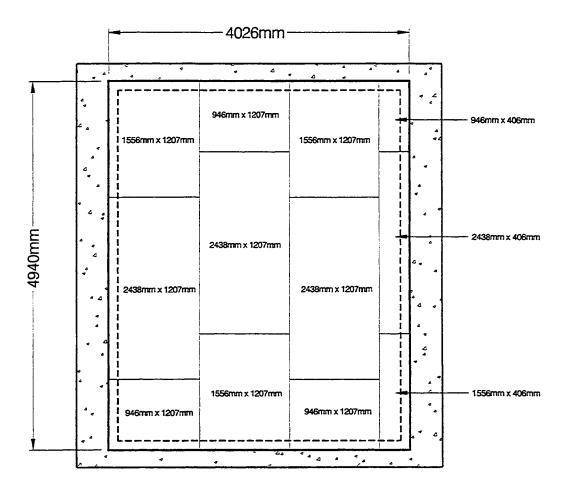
Face layer subfloor layout, joists 610 mm o.c.
